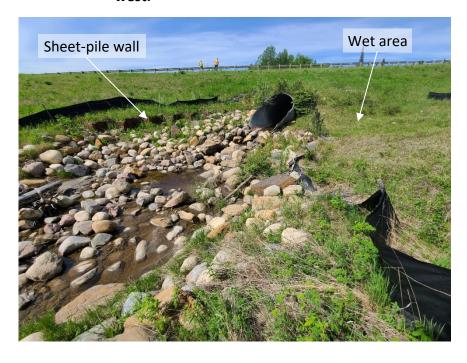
Culvert outlet and riprap at GP38-II site is a barrier to fish passage. Photo taken June 15, 2022, facing southwest.
